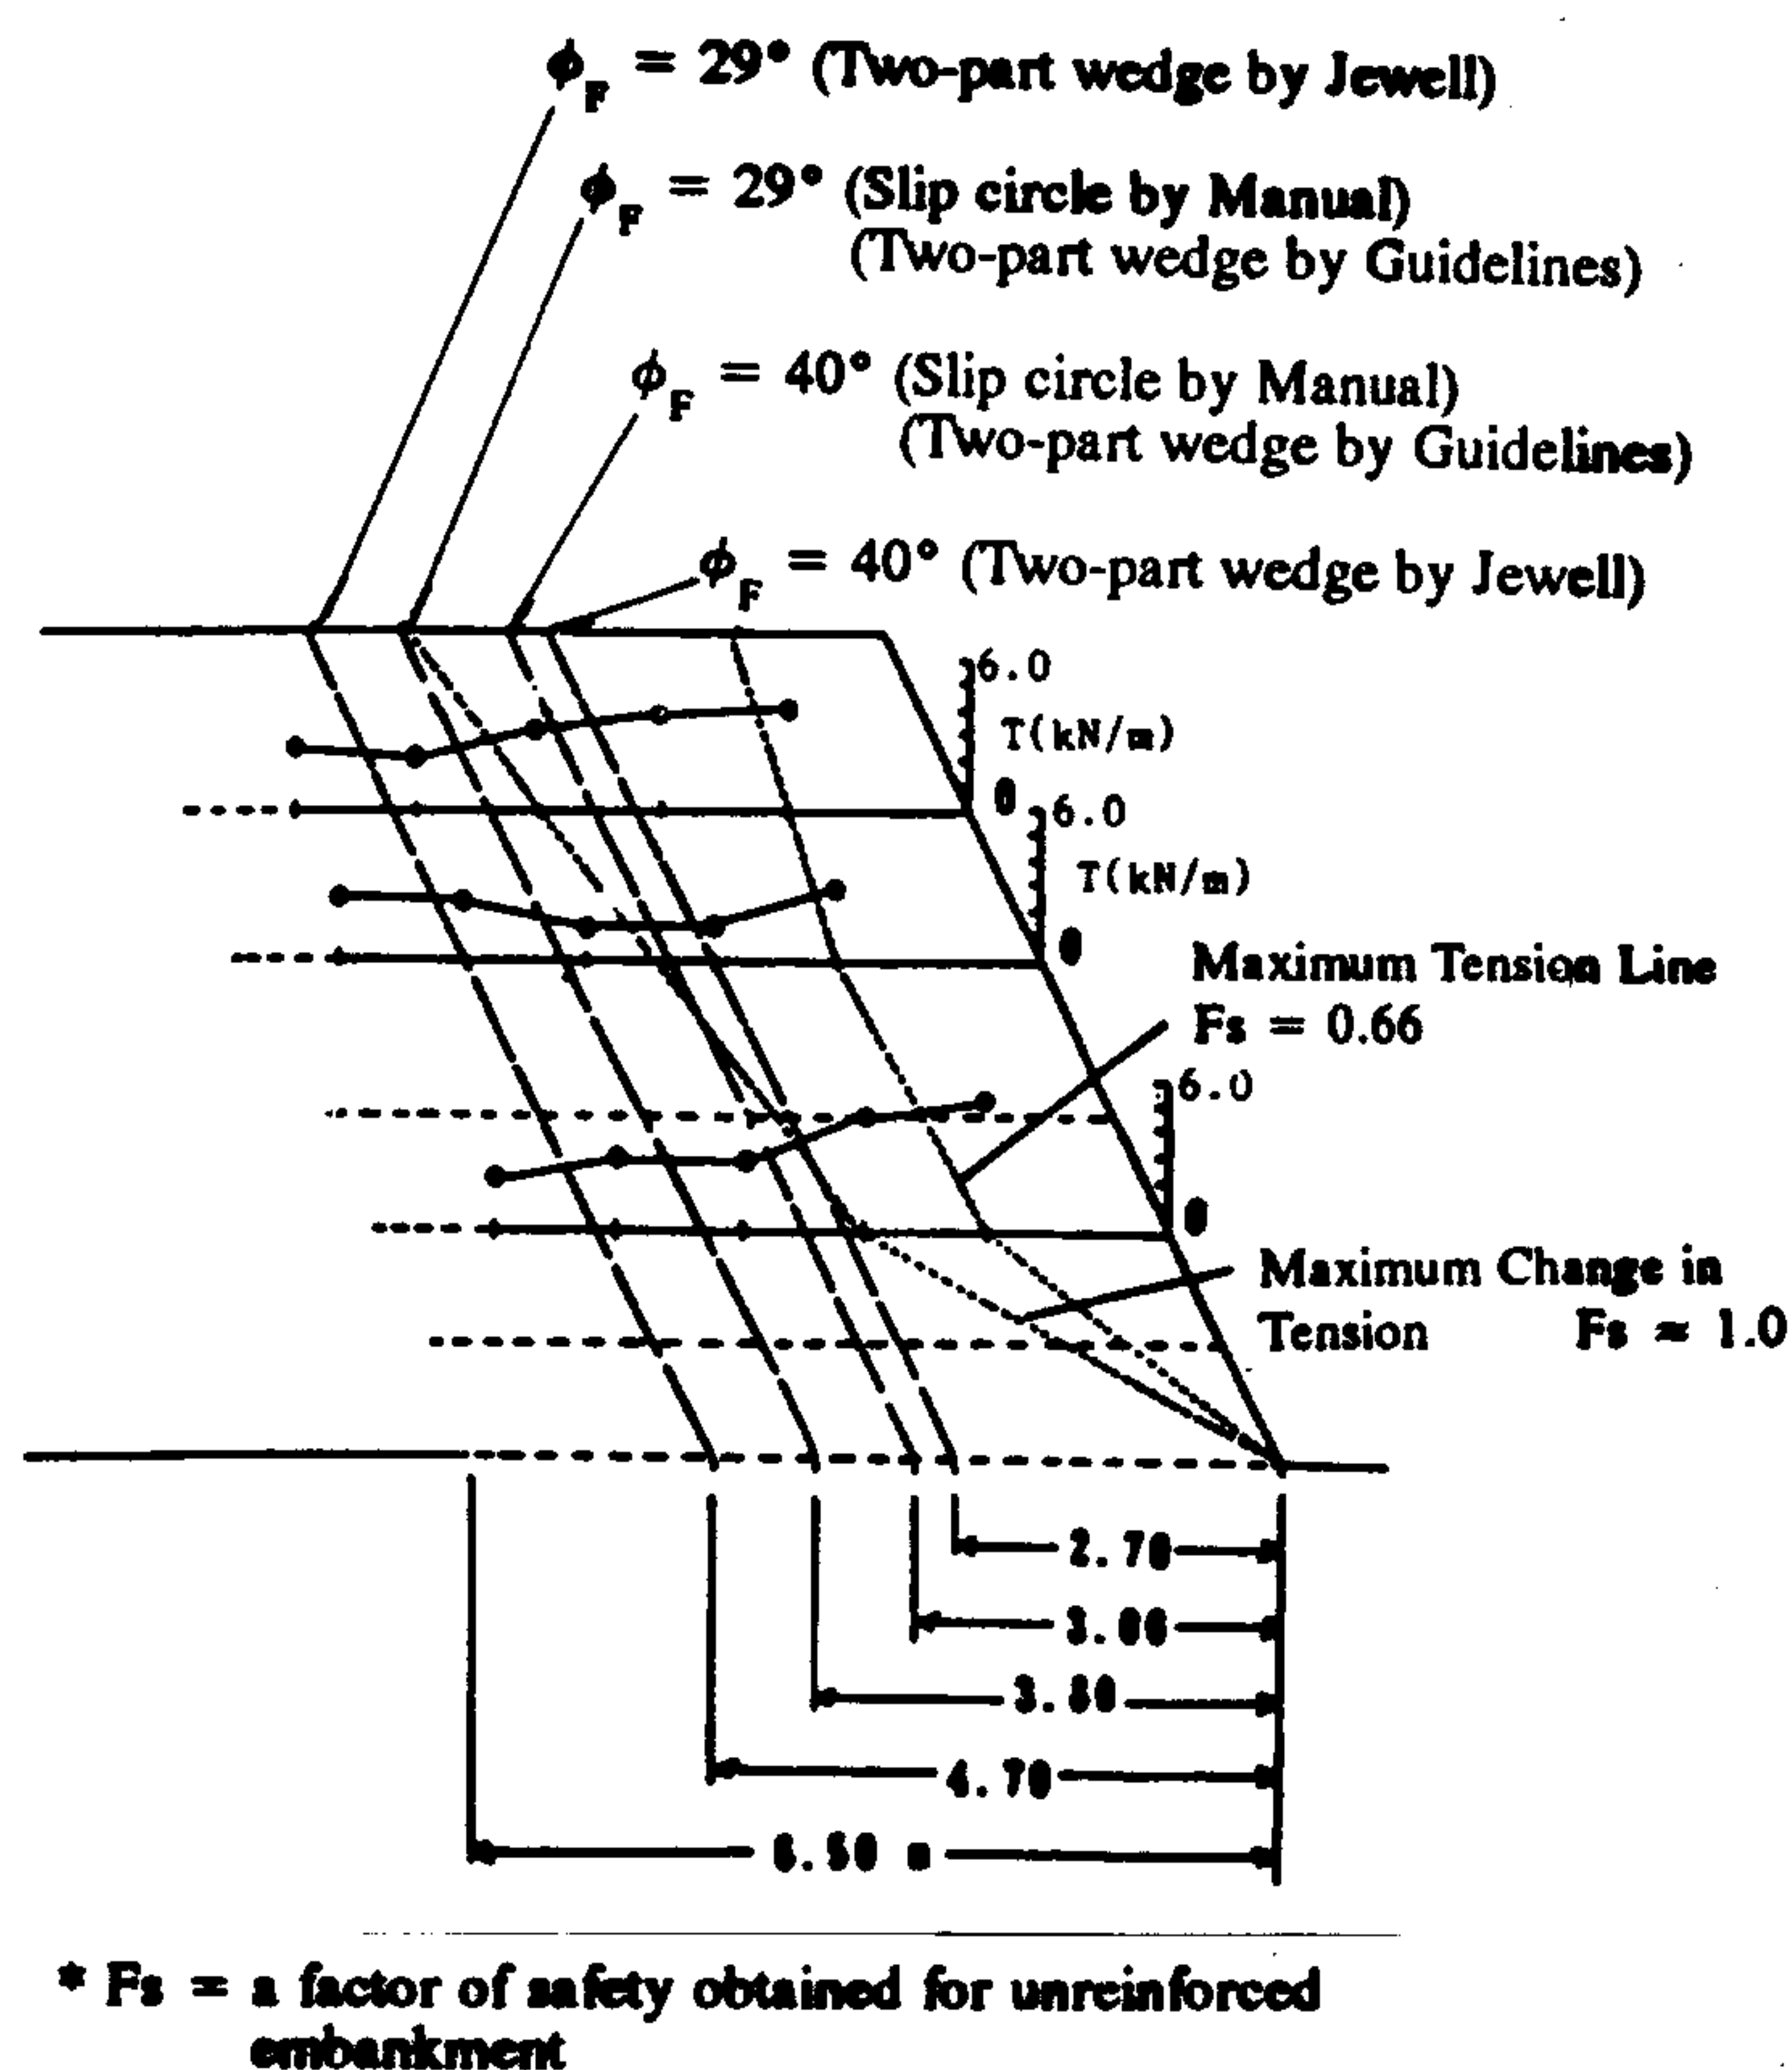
Observed tensile force in reinforcement and required reinforcement zones estimated by various design methods
